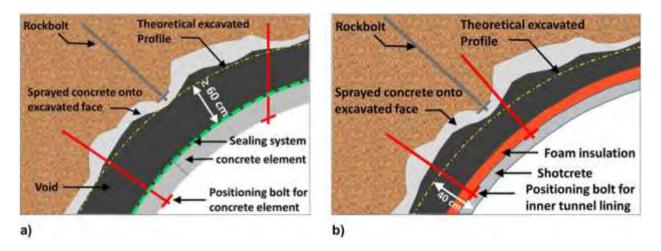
(a) Inner lining with precast concrete elements; (b) foam isolation – sprayed concrete lining (after [21]).
